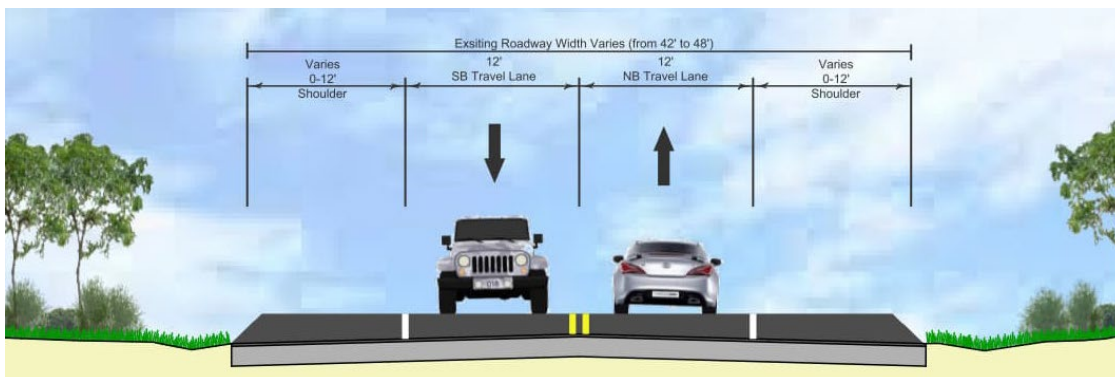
Existing Typical Section MD 272 Irishtown Road to Hance Point Road/Shady Beach Road
